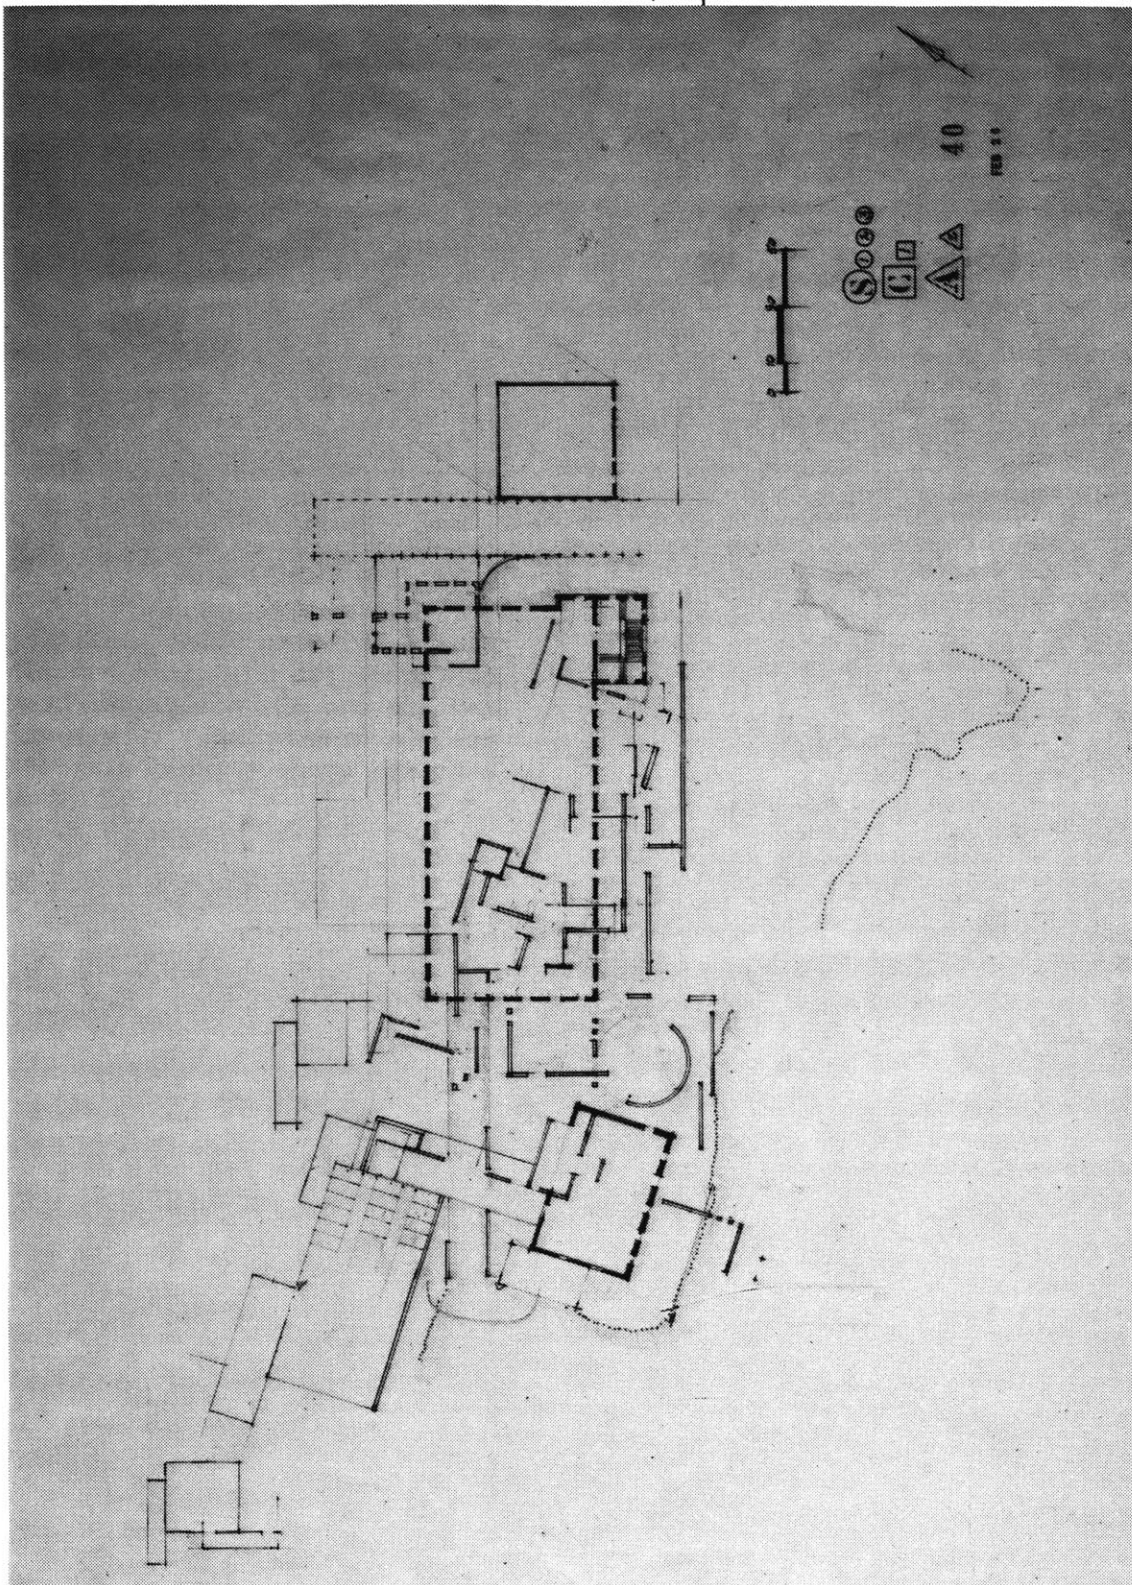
Site plan. Greenhouse located at western side of site, along river. Access to building along eastern and northern side.
